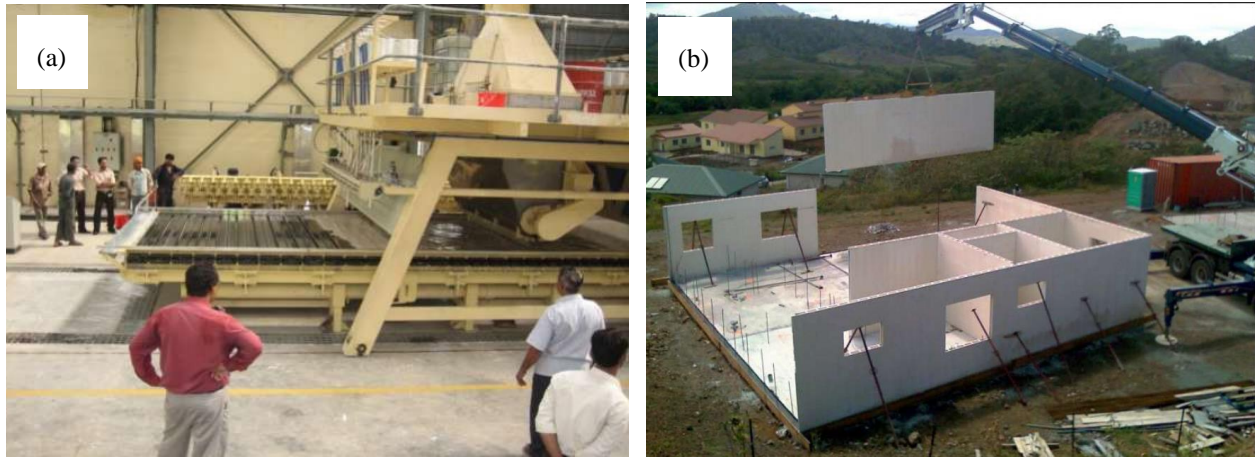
(a) manufacturing sandwich panels. (b) Sandwich panels assembly (Inovatec Systems, 2016)
